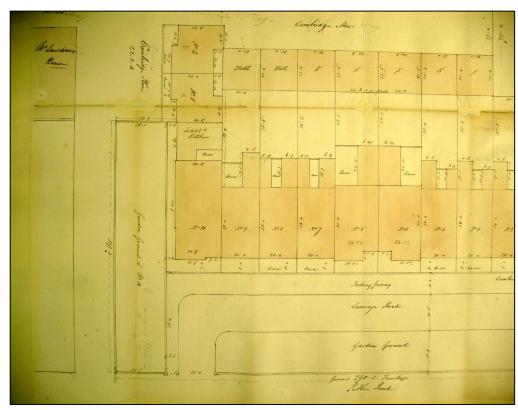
Sketch plan of Cambridge Terrace 1826 from John Nash's Office (TNA MP 1/585)
